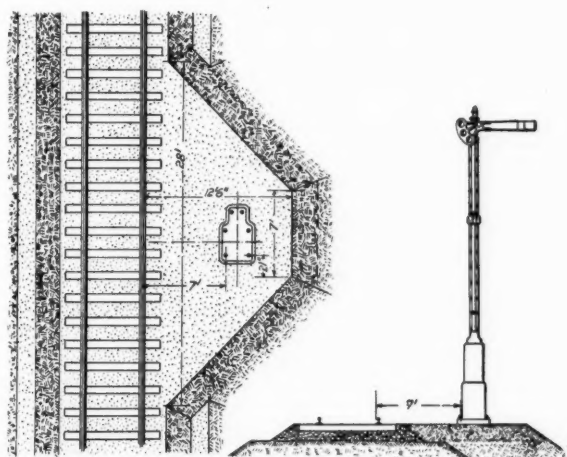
Signal Foundation on Embankment, S. P. Co.
